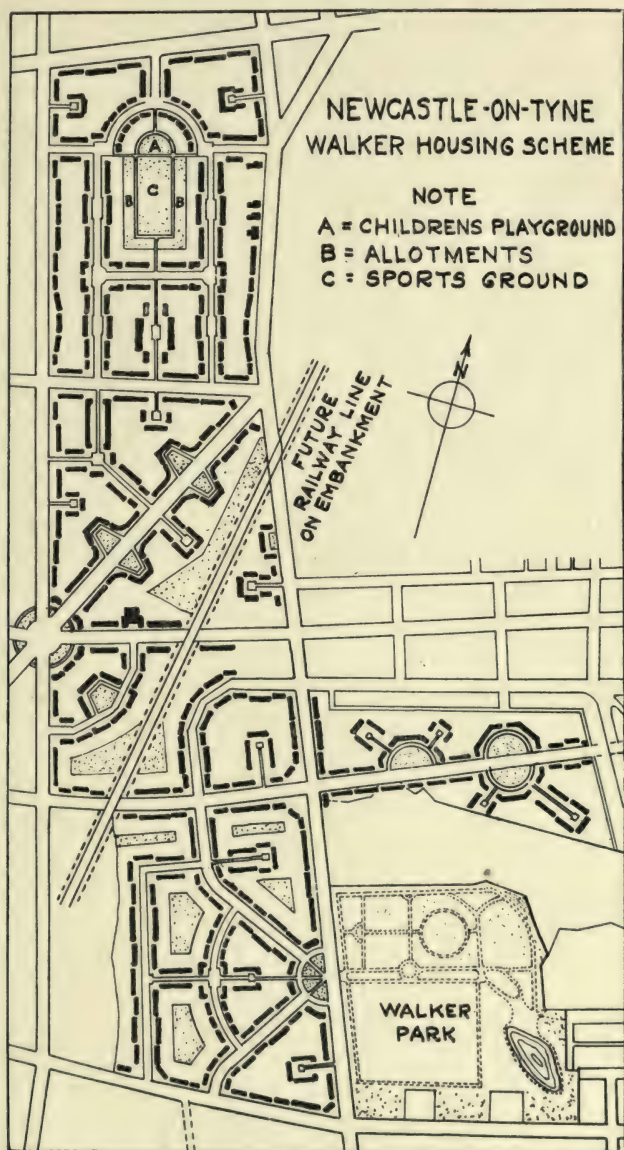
Lay-out plan for Walker Estate, Newcastle-on-Tyne.
